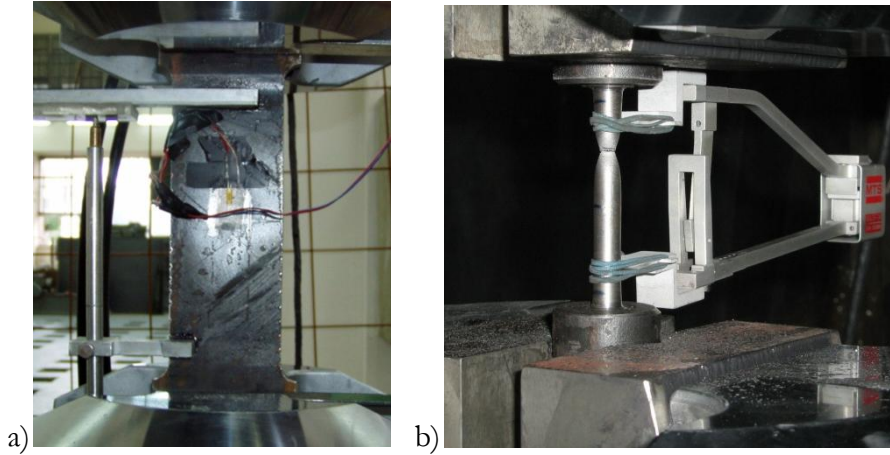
Coupon sampled from a plate of riveted specimen under testing (a); rivet coupon under testing (b) (D’Aniello et al. 2010).
